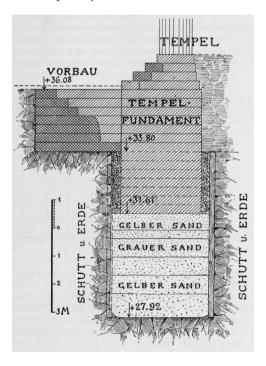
Ilion Temple of Athena foundation, detail. Sand layers under foundations (Dörpfeld 1902, Fig. 85).
